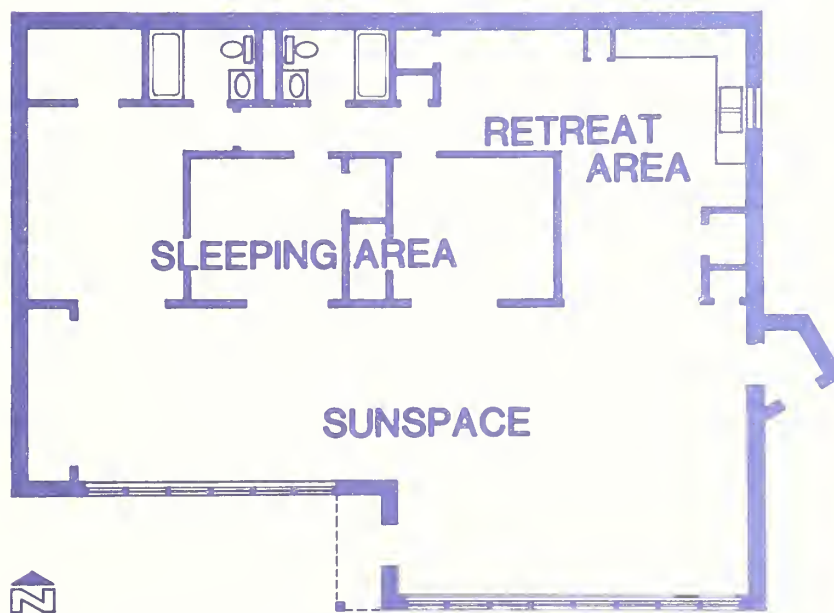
Floor Plan of Multi-Therm Solar Earth House
